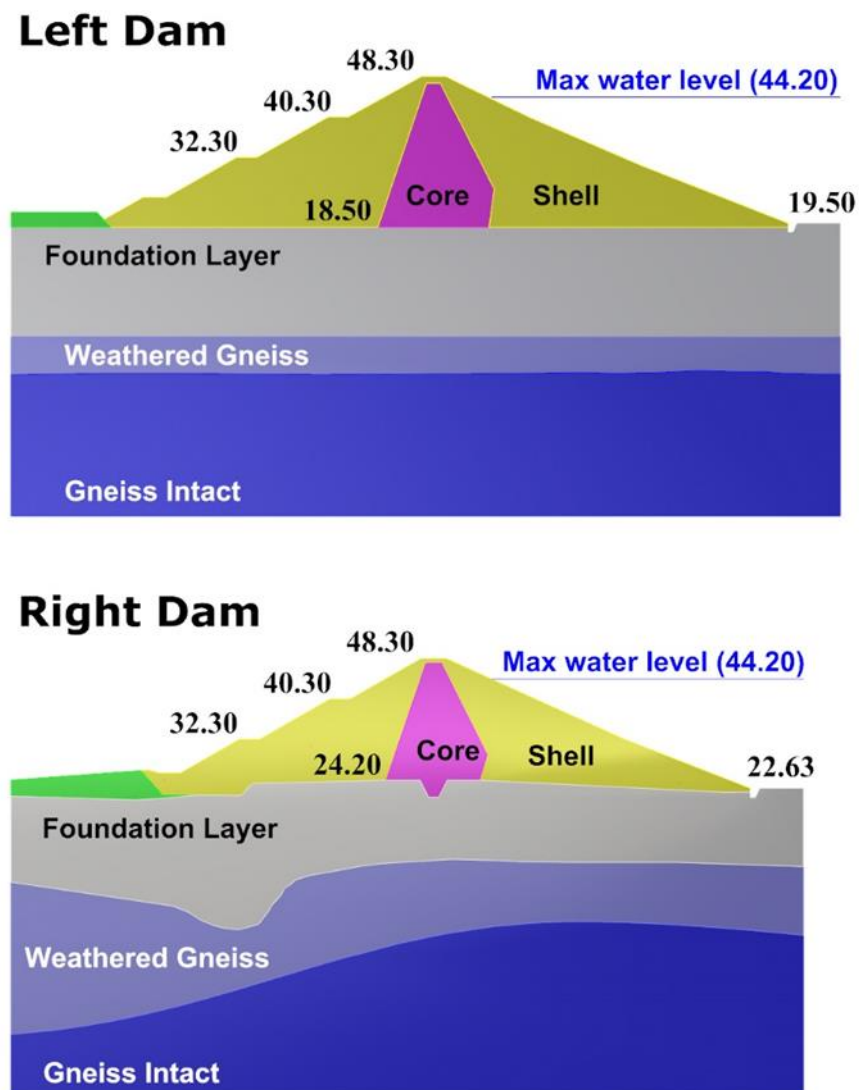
Foundation layer model cross-section. Left dam (above) and right dam (below).
